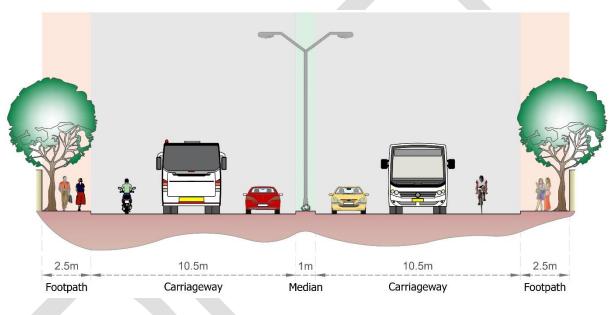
Typical Cross Section of 27m Wide Road with Footpath
